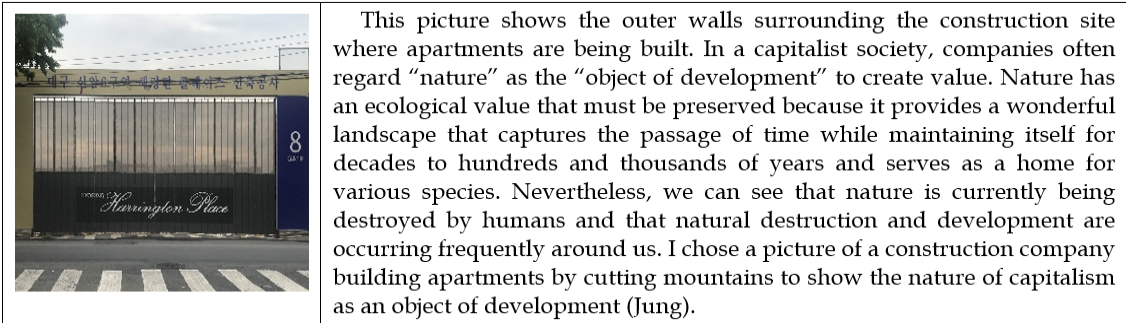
Construction site of an apartment building by cutting mountain (Source: Field study)
